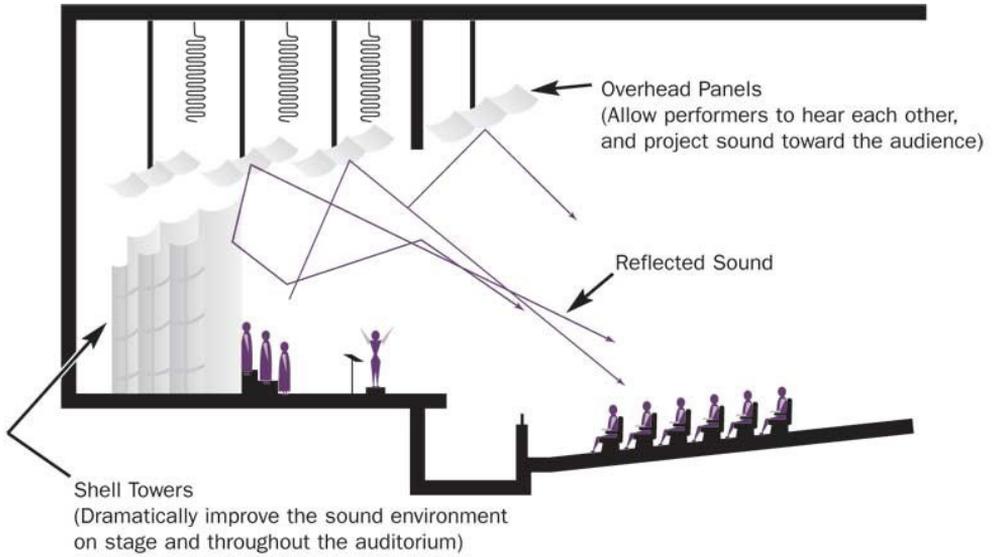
Acoustic shell – sound-reflective shell towers and overhead panels surrounding the performers (source: [16])
